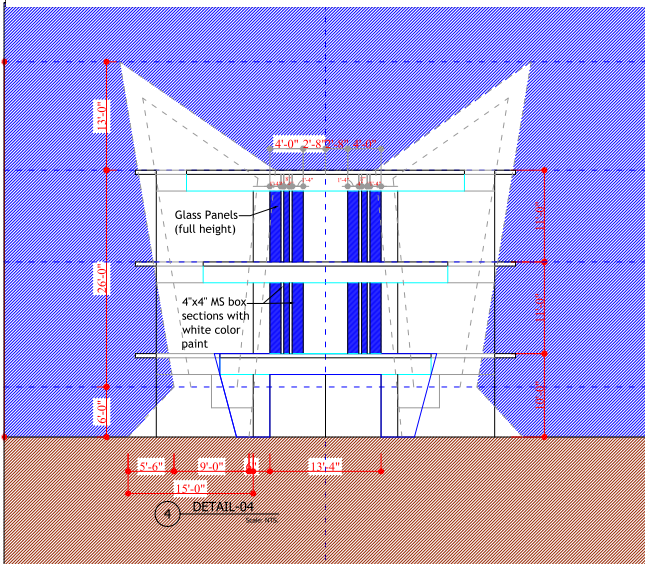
Elevation Details - Stage#2: Wings finishing detail
